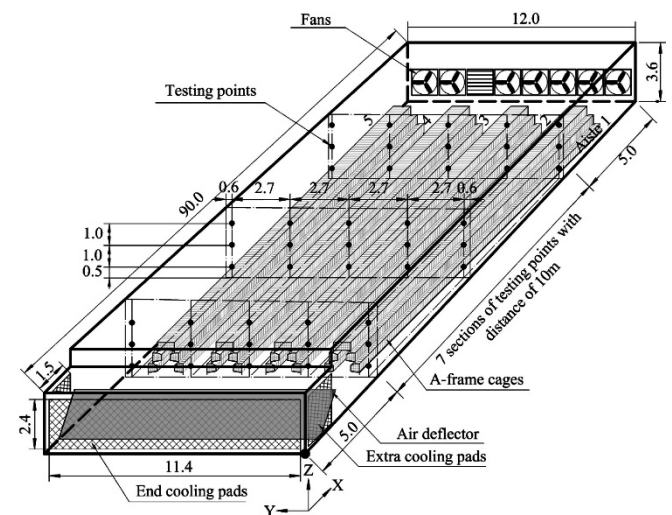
Layout of experimental poultry house and the location of testing points (unit: m)
